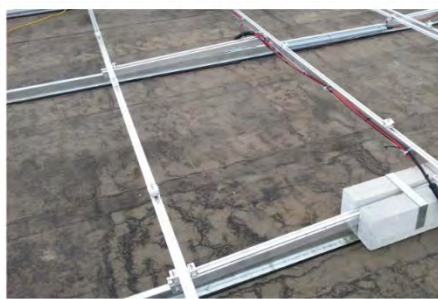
East West rails can be used to secure PV wire. In this image, the installer has used PVC straps secure on the rail to support the PV wire.
